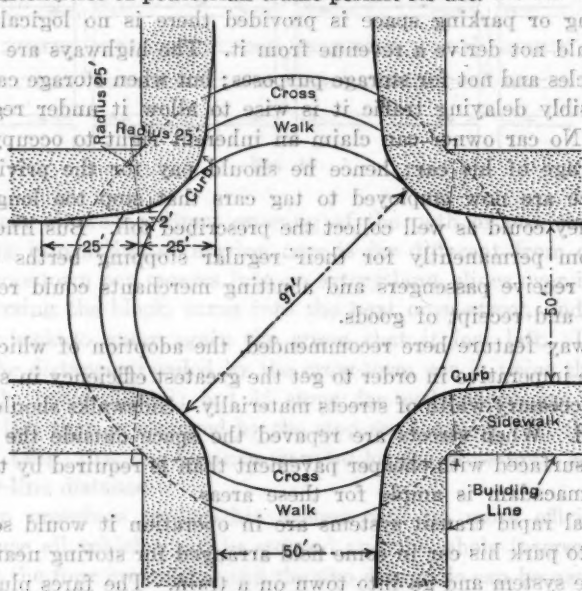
STREET INTERSECTION. PROPOSED METHOD OF LOCATING CURB CORNERS AND CROSS WALKS.
